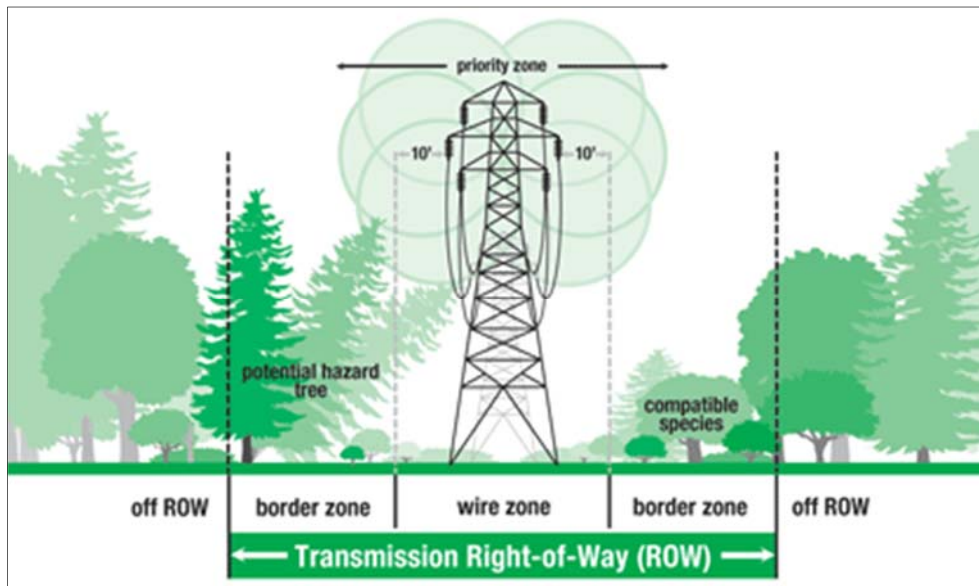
Typical Cross section of 220 kV OHL RoW
